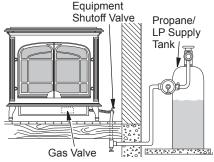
Checking Gas Joints for Propane/LP Gas Burner System (Oxford™ Model Shown)
